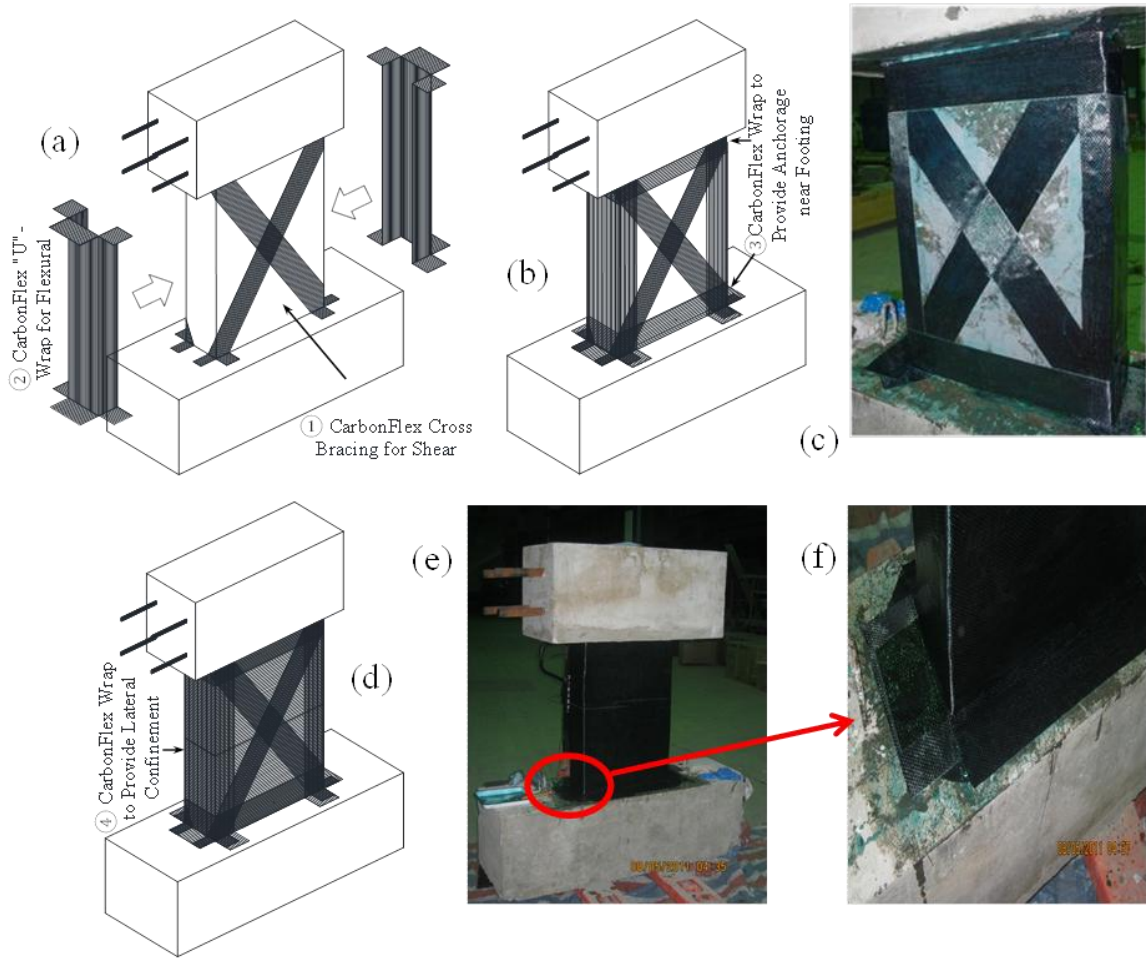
Retrofitting scheme for the damaged R/C shear wall: (a) Shear and flexural resistance applied to shear wall; (b) additional anchoring support at high-stress points near wall base; (c) the shear wall specimen following Step 3; (d) system wrap; (e) final lay-up of base carbon-fiber wrap; and (f) close-up of wrap at base of wall [144]²¹
